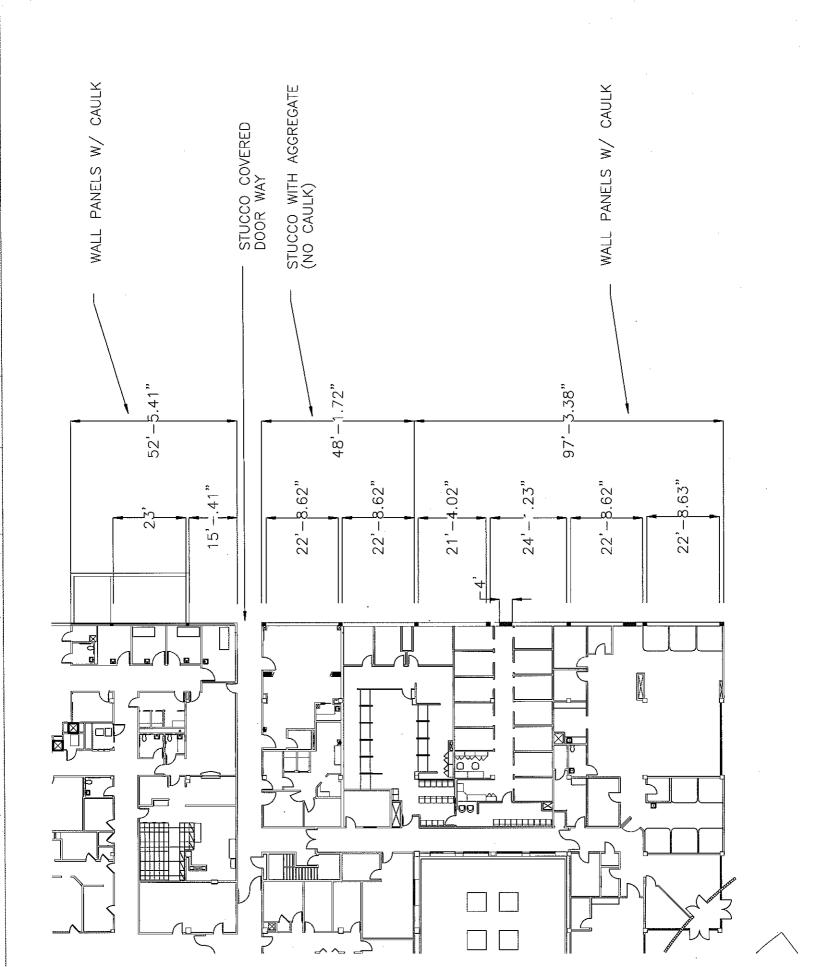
CONSTRUCTION OF CONTAINMENT UNIT SOUTH WALL
